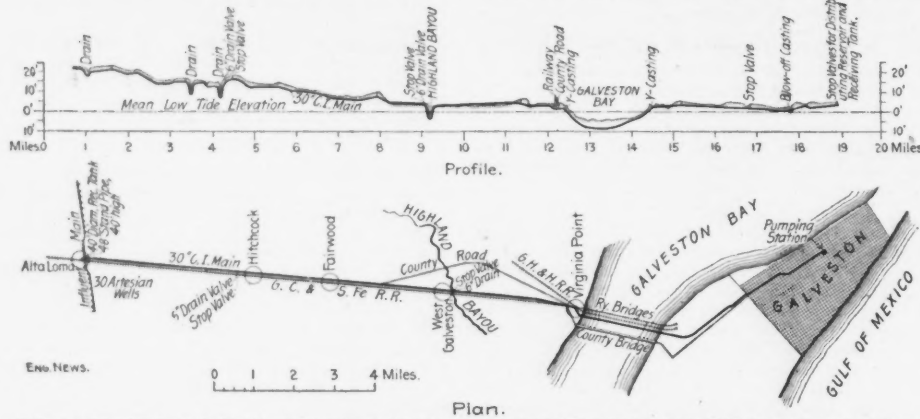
PROFILE AND PLAN SHOWING CONDUIT AND ARTESIAN WELLS FOR THE WATER SUPPLY OF GALVESTON, TEX.
